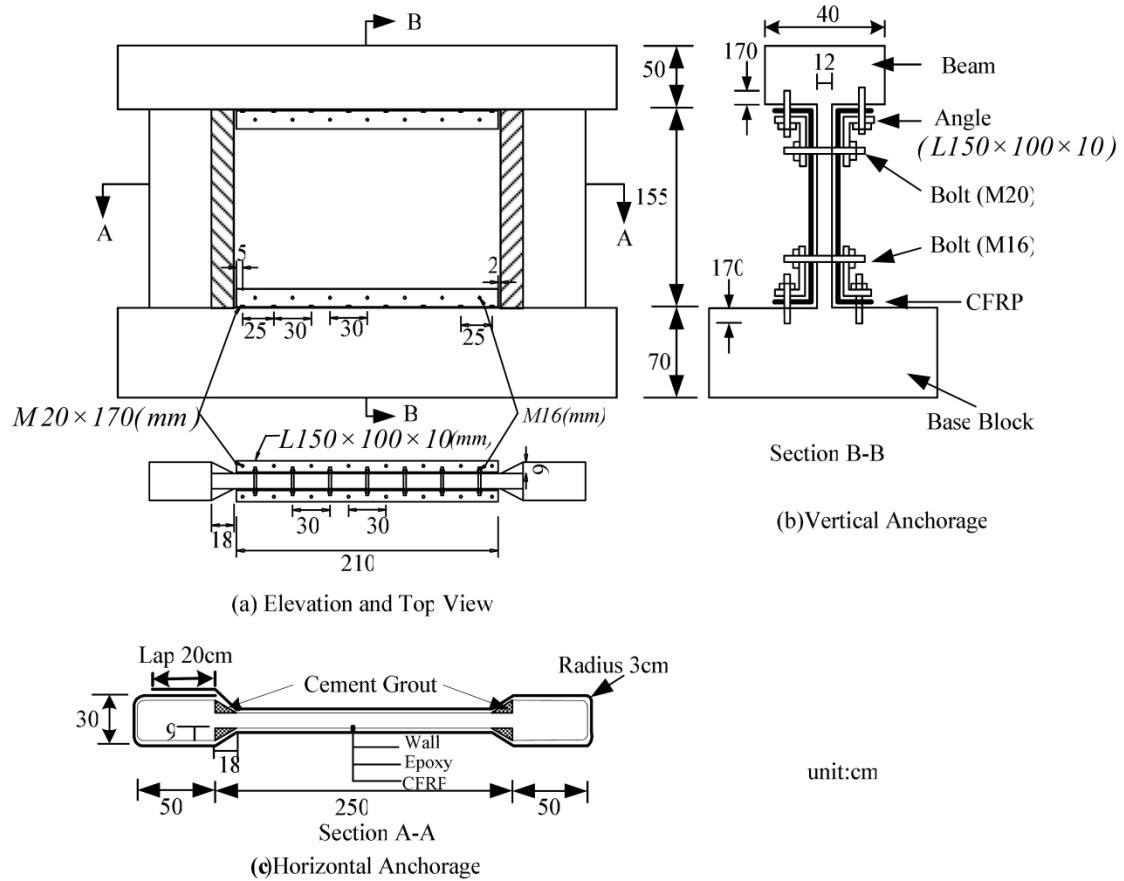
Details of the specimens tested by Hwang et al. (2004)
